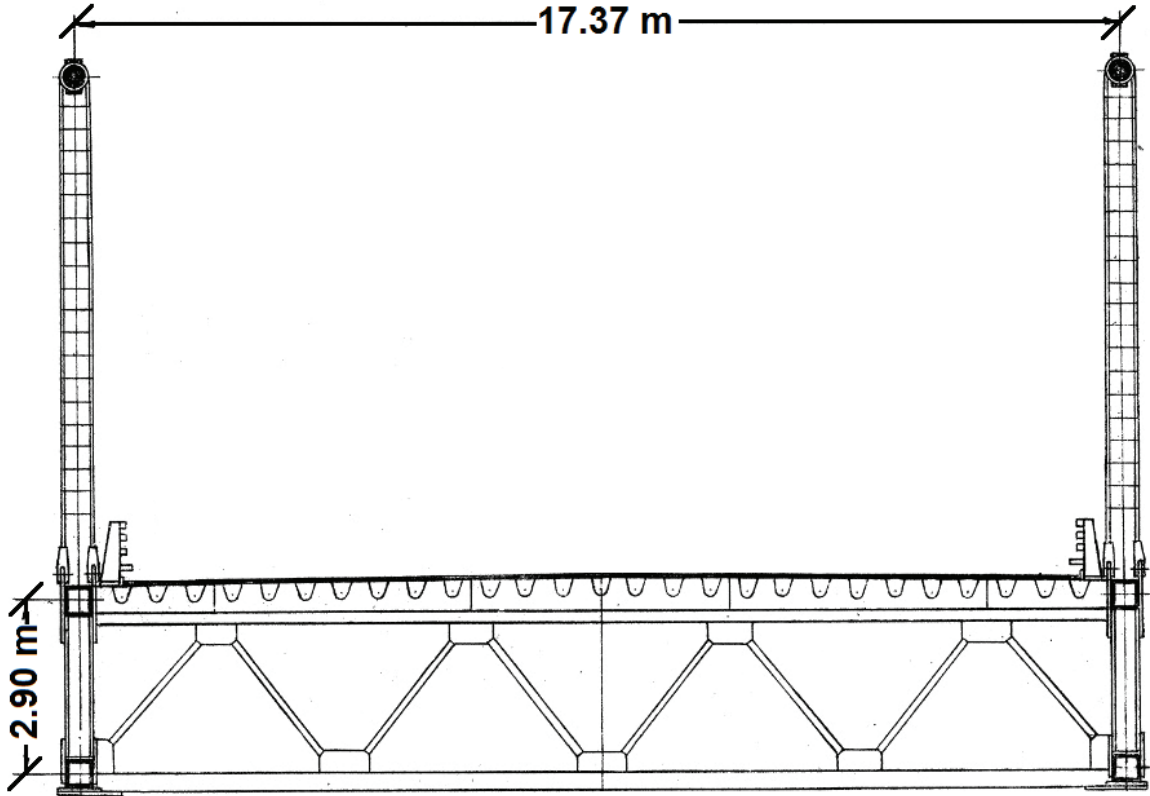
Orthotropic deck and transverse stiffening trusses (adapted from B&T)
